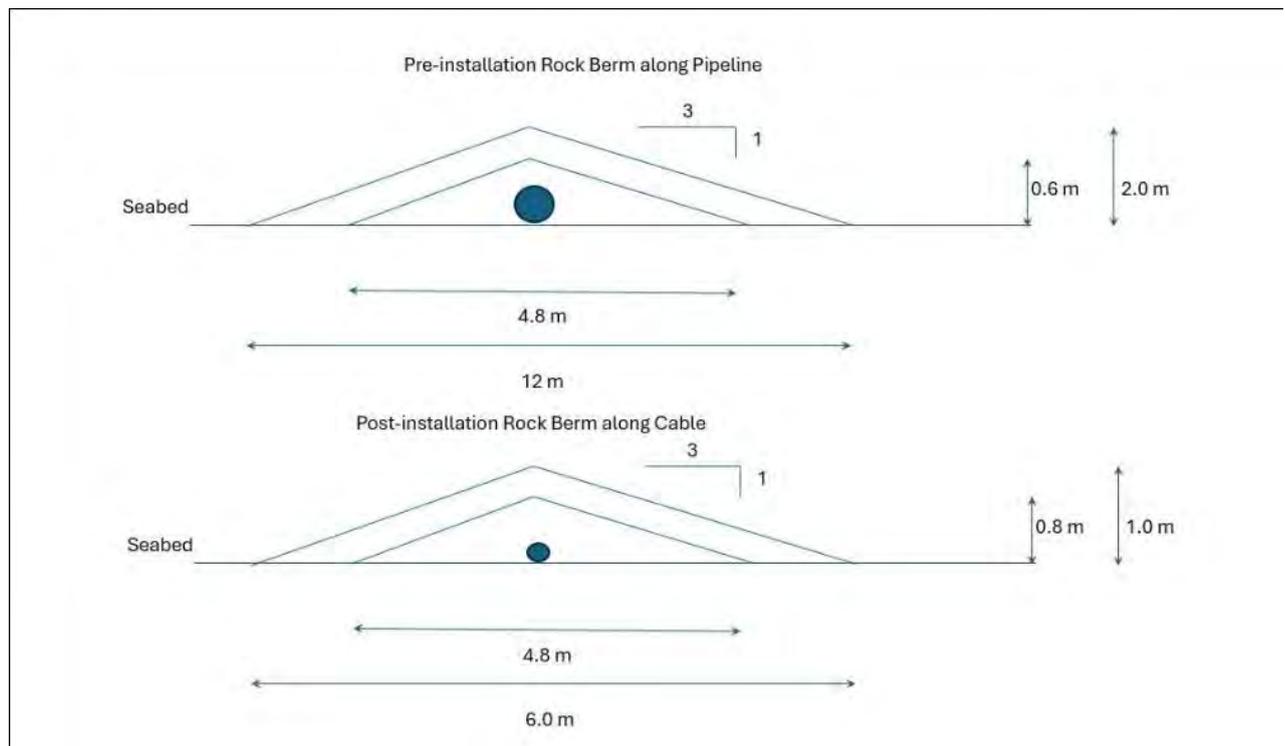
Cross-section profile of pre-installation and post-installation rock berms
